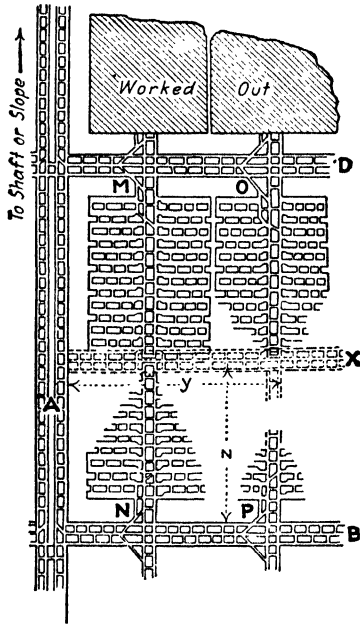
Plan for driving new entries to reduce length of haulage.
